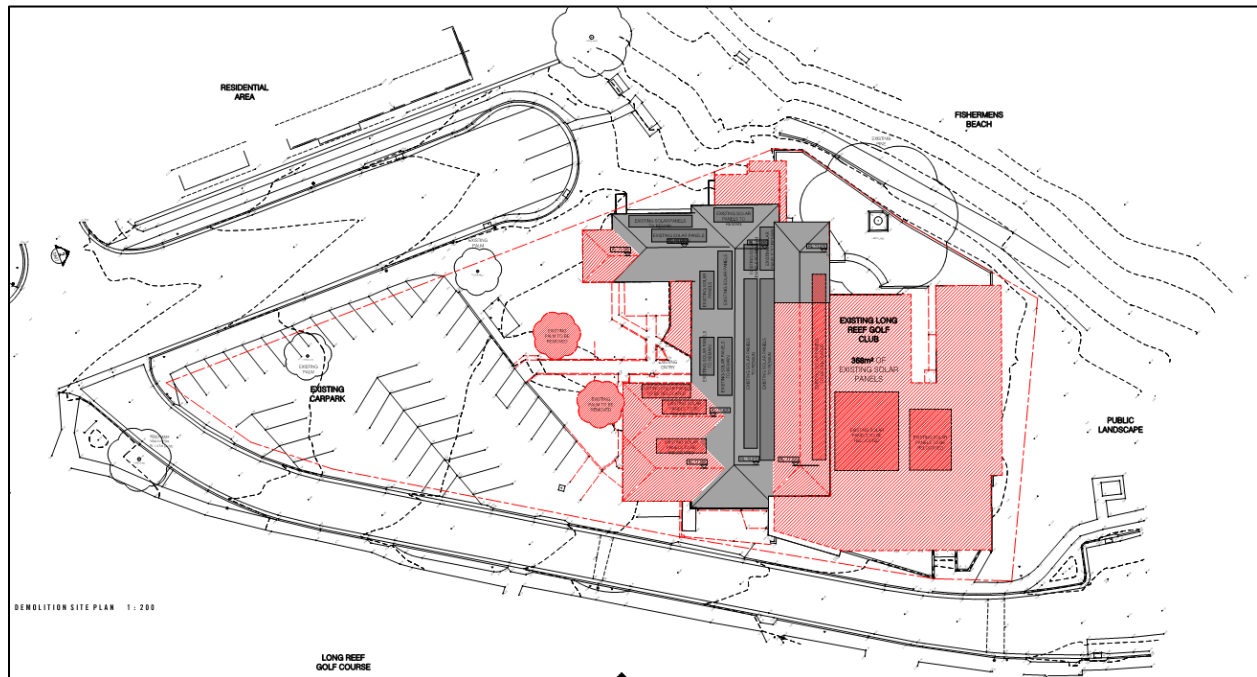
Proposed Demolition Roof Plan (Source: i2C; 2025)
